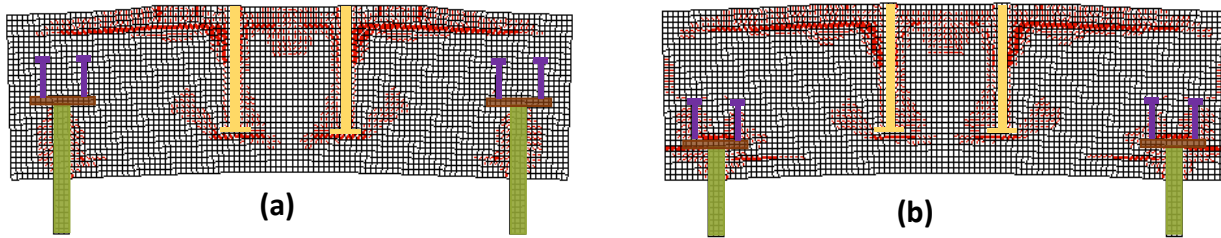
(a) Flexural cracks around top longitudinal reinforcement; (b) Flexural cracks around top longitudinal reinforcement with local cracks around the bottom plate.
